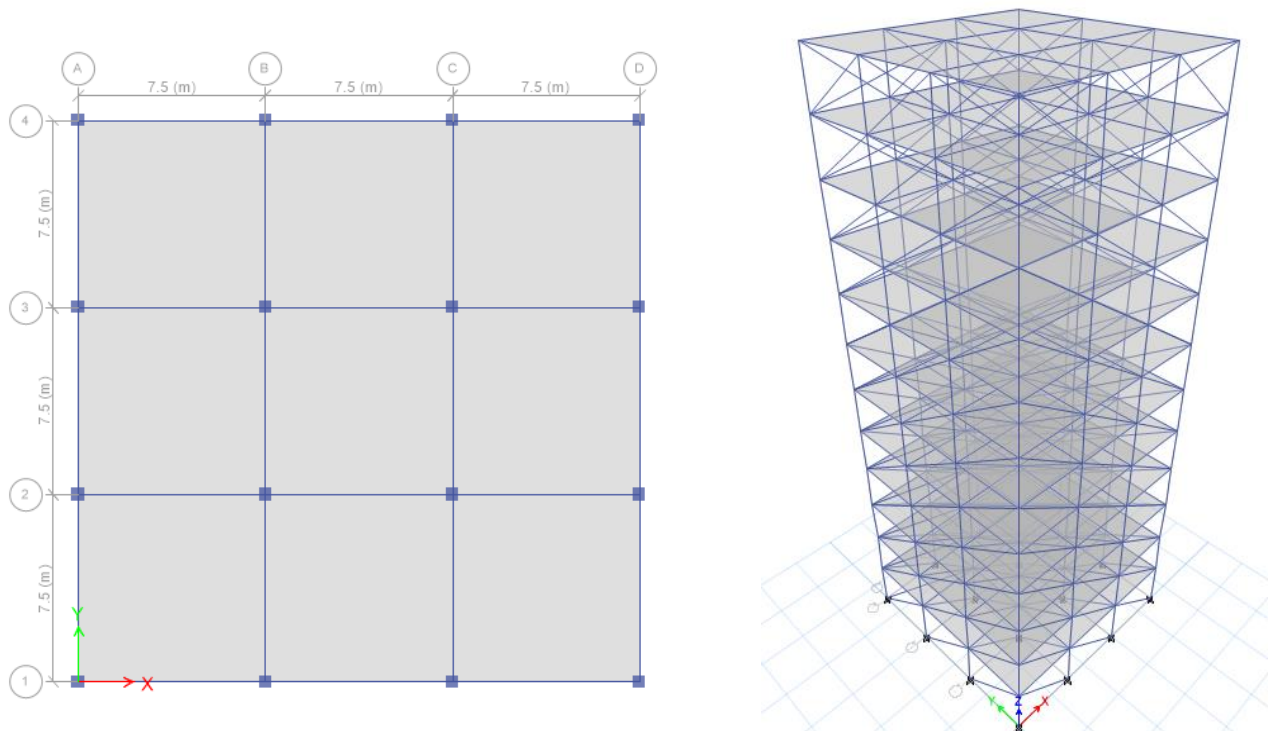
Plan and 3D view of 12 Storey building with equivalent diagonal strut
